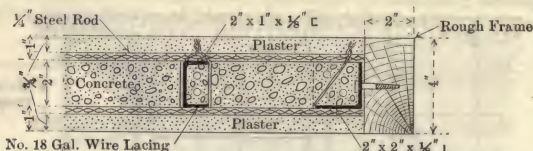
Four-inch Solid Plaster and Concrete Partition. Horizontal Section
